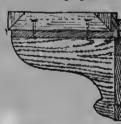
Section of Lower Part of Corner Bracket (eee Fig. 1199).
